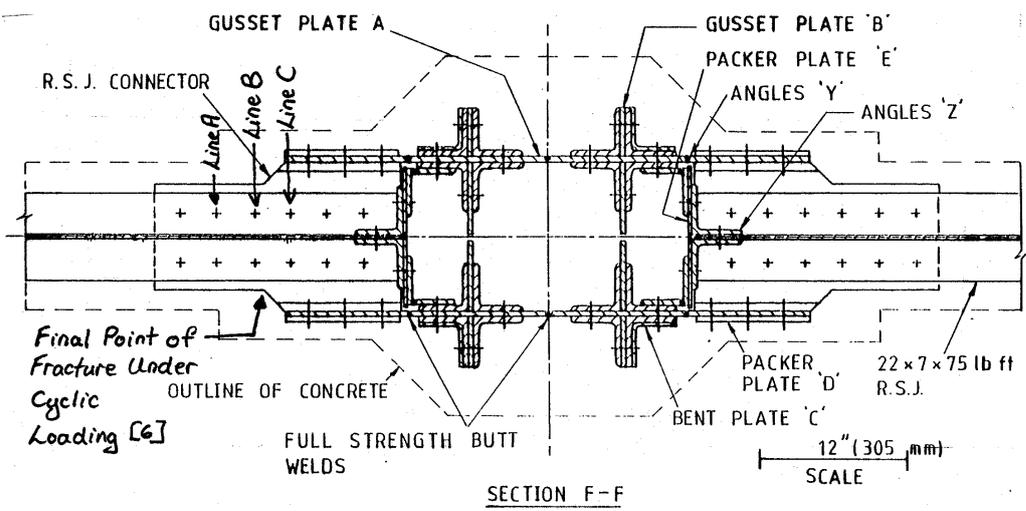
A.2: Riveted steel fabrication details, Government Life Insurance Building, 1937 (Wood, 1987)
